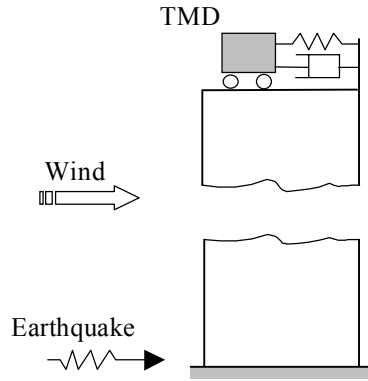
Tuned mass damper (TMD) located on the top of a building
